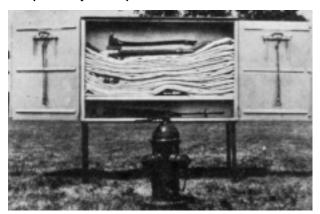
(a) House of five-sided design for installation over a private hydrant.
